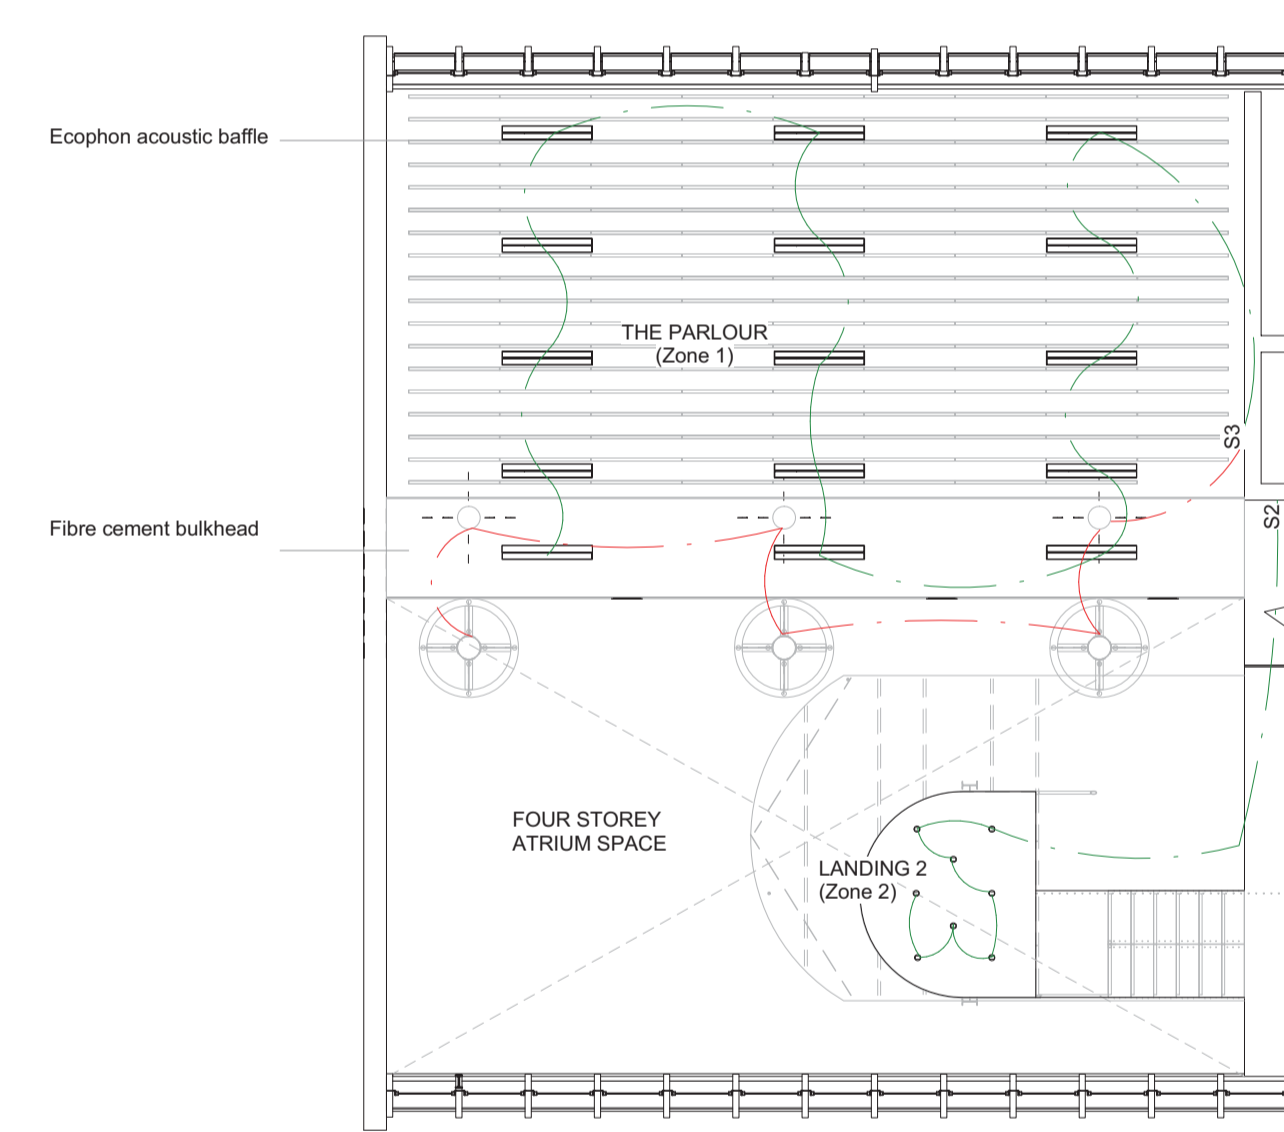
UPPER GROUND FLOOR LIGHTING PLAN
